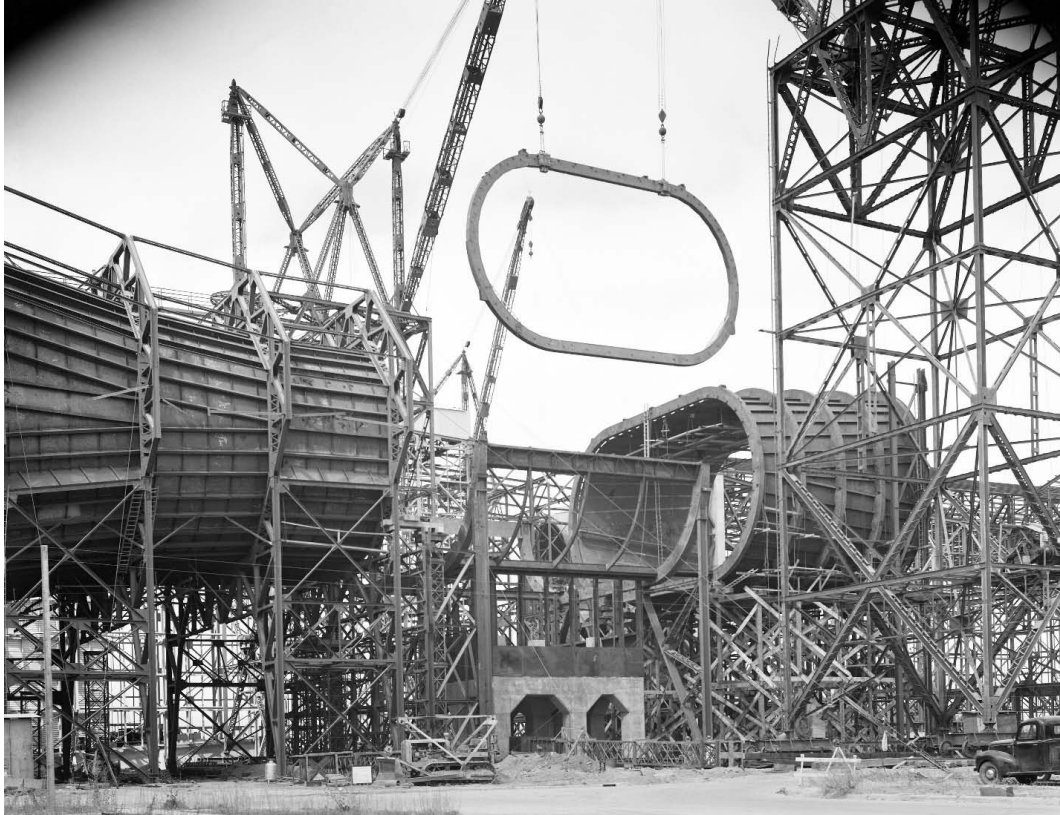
Installation of a test-section bent showing the flat-oval shape of the test section.
